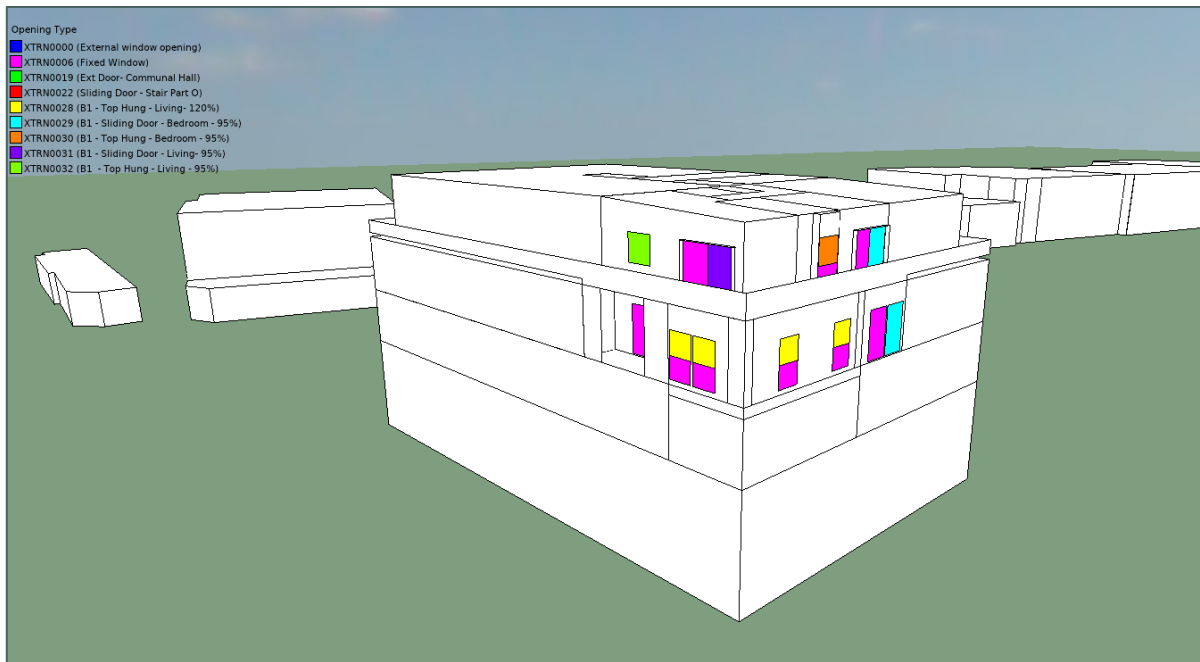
Opening Types applied within the Block 1 (view from Southwest Elevation)
